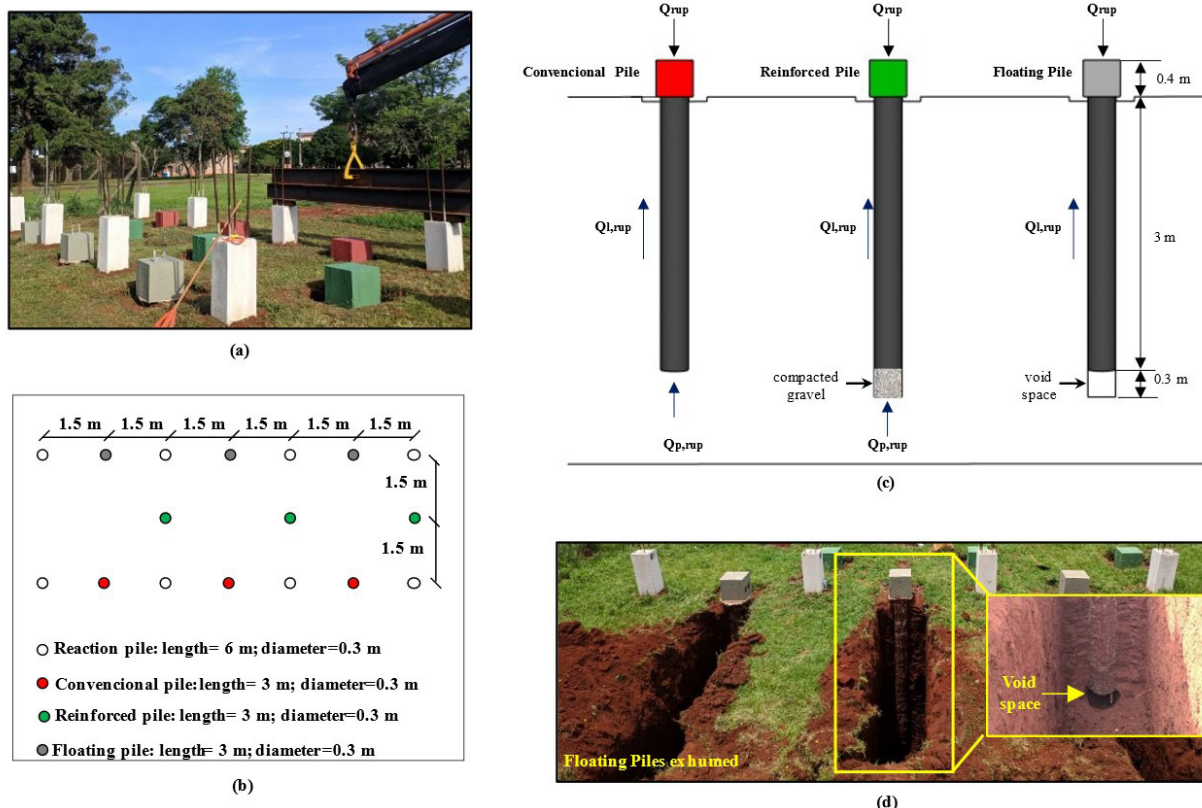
(a) piles executed; (b) arrangement of piles; (c) characteristics of structural elements and (d) exhumed floating pile.
